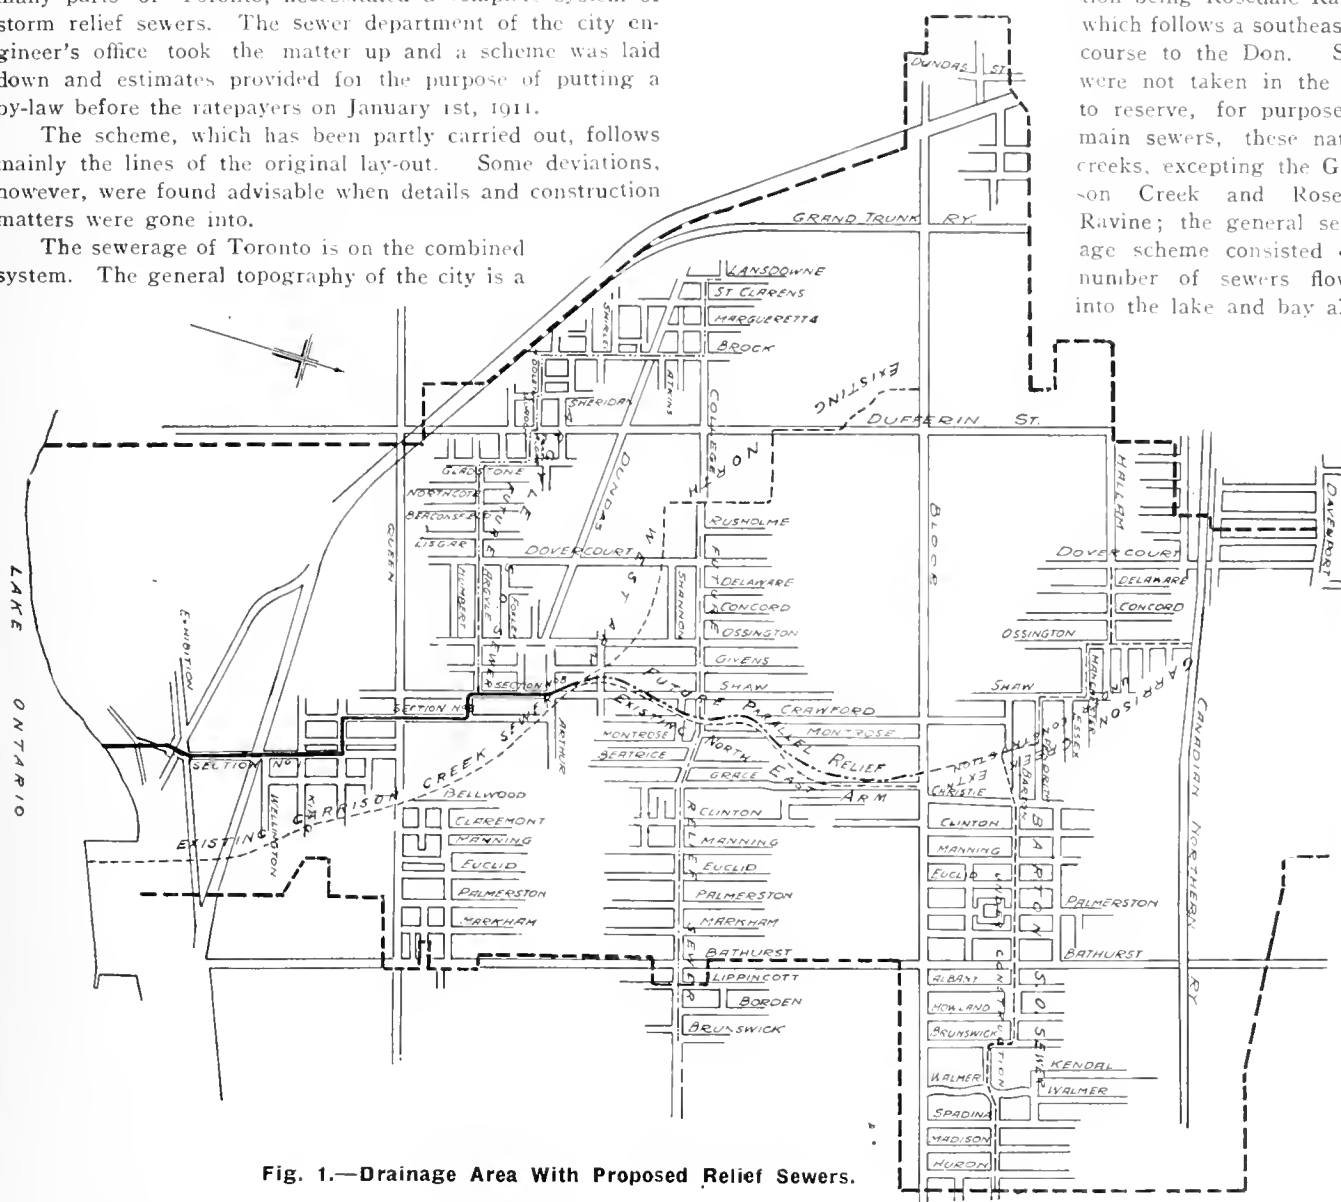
Drainage Area With Proposed Relief Sewers.
